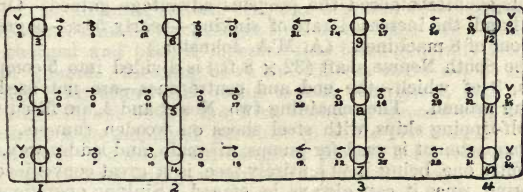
VERTICAL SHAFT (32×9 FT.), SHOWING POSITION OF BARS, MACHINES AND HOLES.
